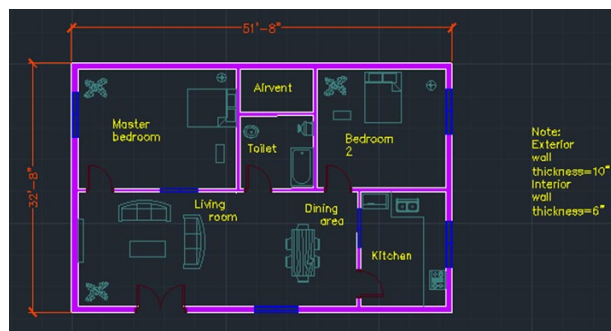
Architectural Auto-Cad plan for the design of ZEB
